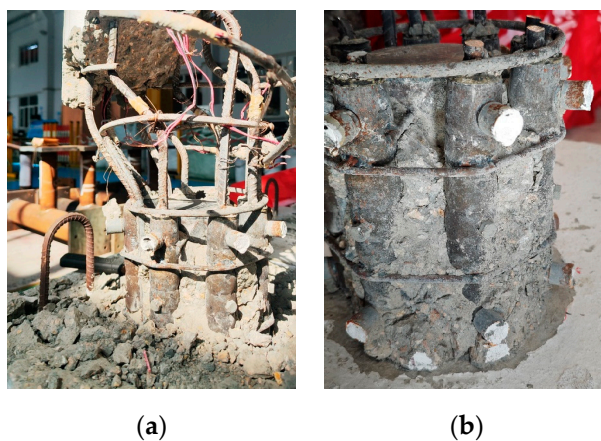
Failure modes in components. (a) Reinforcing bars; (b) grouting sleeves.
